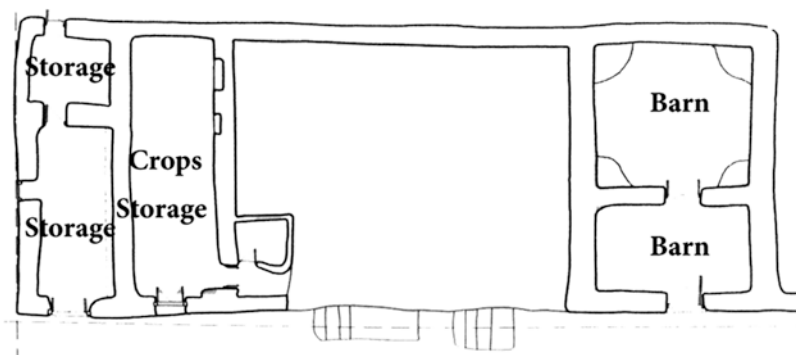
Mohtashemi Talab house, closed spaces layout in ground floor (Taleghani 2010b)
